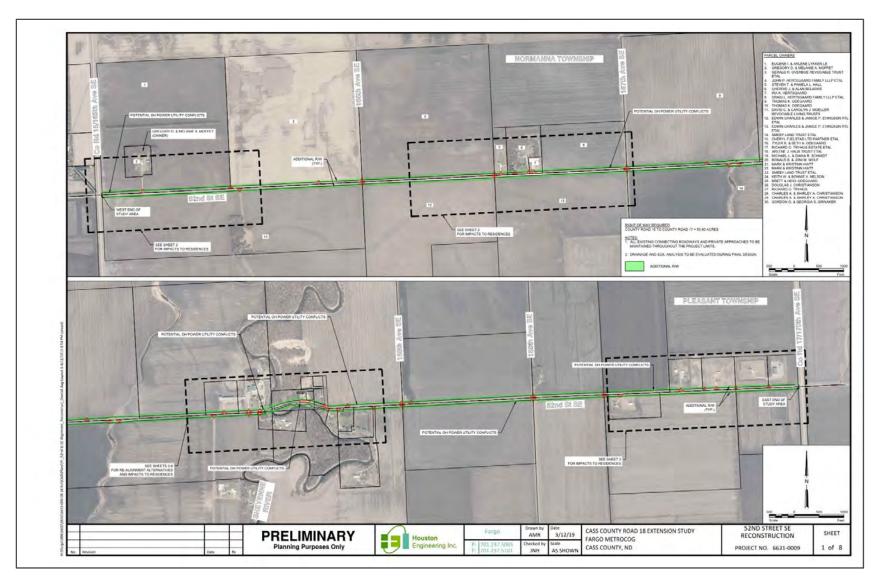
Existing Alignment with Cass County Typical Roadway Section Alternative
